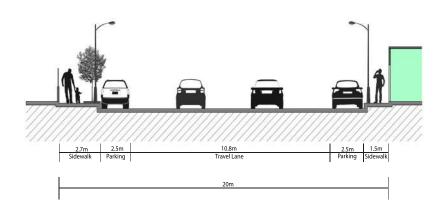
Southern side of Ibn Babawayh Street with no suitable sidewalk and connectivity Section C-C, by author
